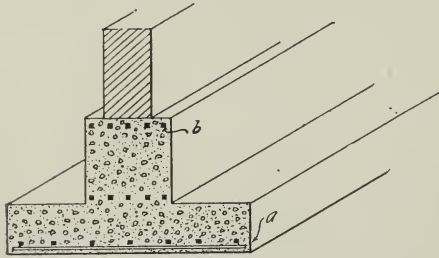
Typical Reinforced Concrete Footing for Heavy Wall.
